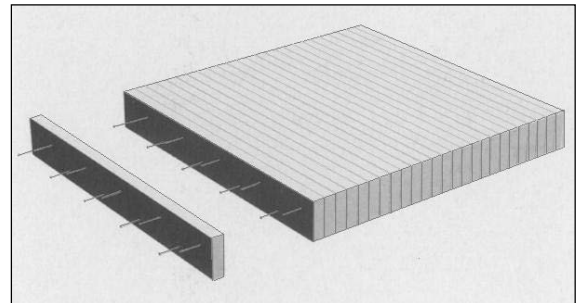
Edge-fixed floor elements, nailed (Kolb 2008)
